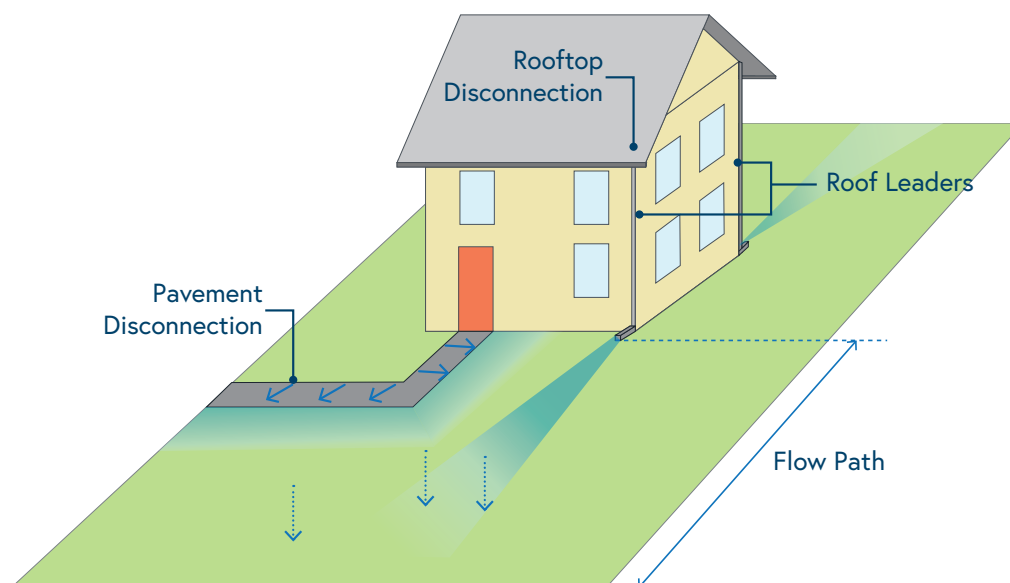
Illustration of Flowpath for Rooftop and Pavement Disconnection
